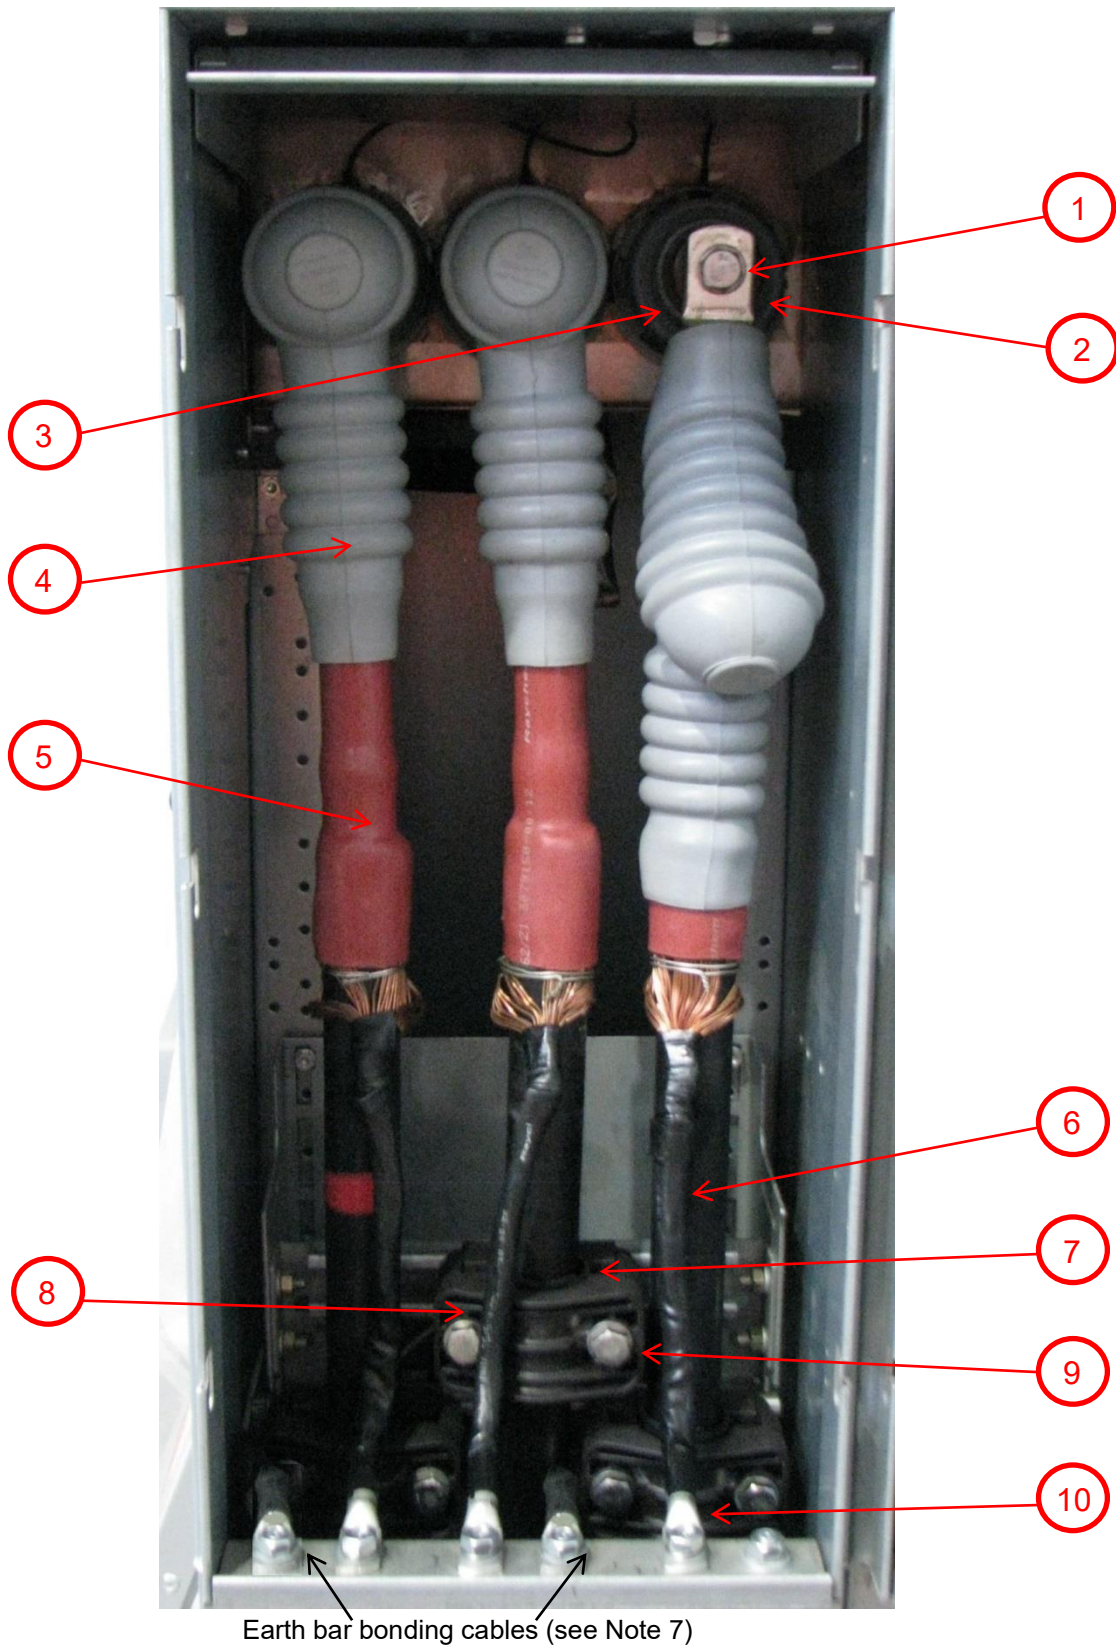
Indoor Feeder Cable Termination (front view)
